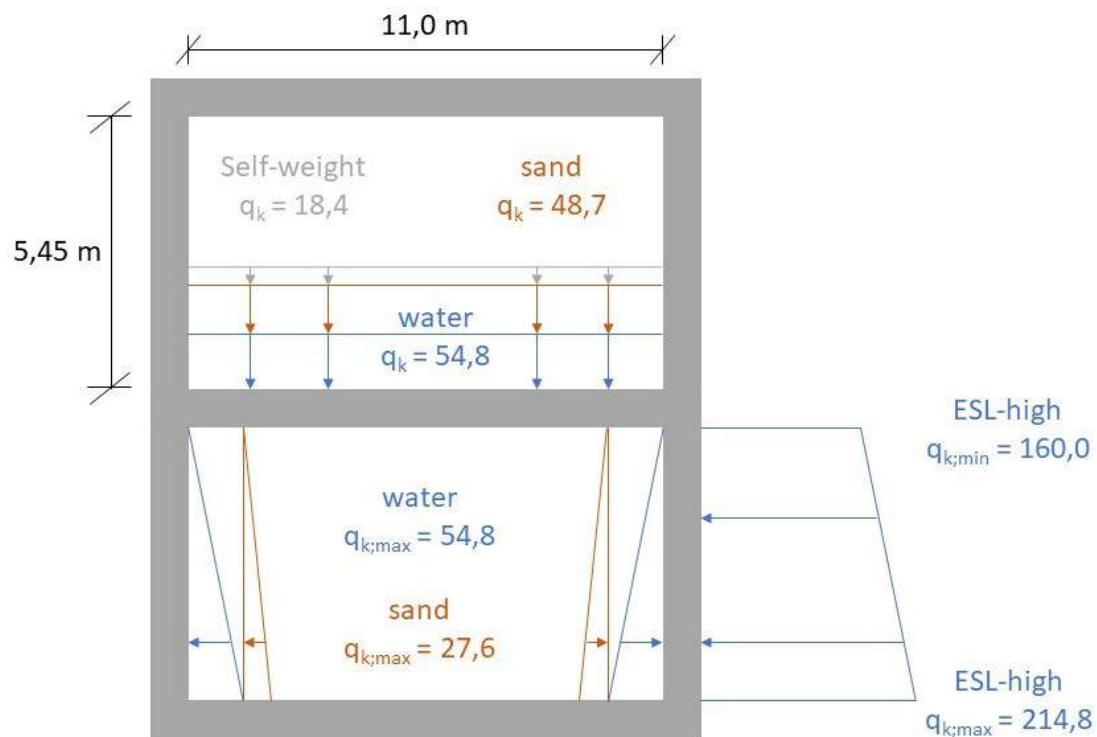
Loading on the floor and walls for the governing elements on the lakeside.
